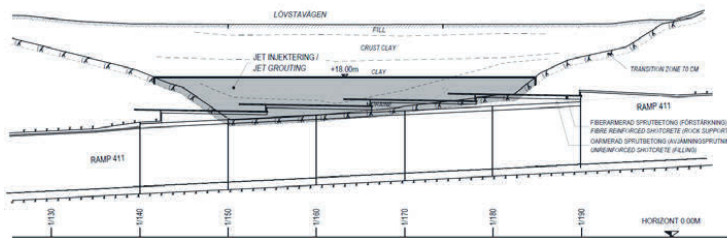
Ramp 411, longitudinal section with indication of anticipated rock surface, pipe umbrella support and jet-grouting
